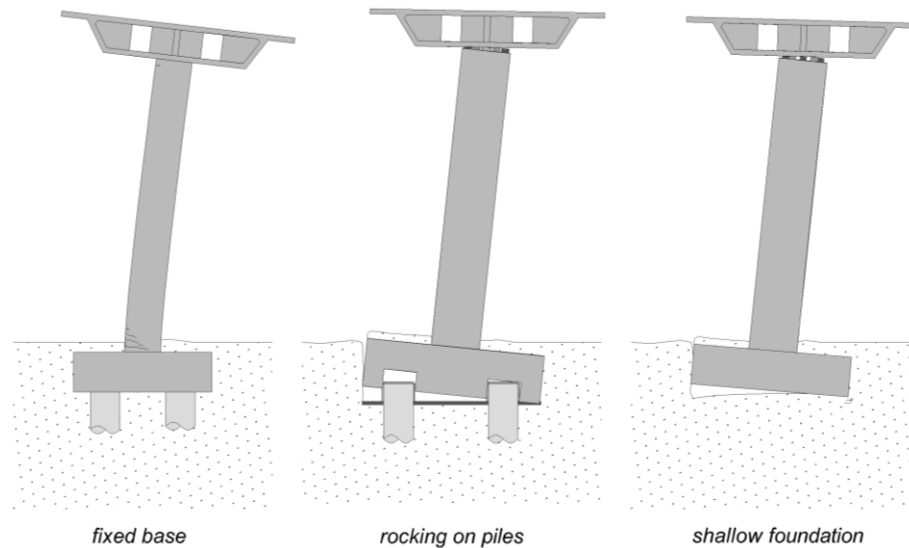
Schematic of foundation, column and deck in a deformed state at a 5% transverse drift ratio for the three designs studied (displacements are drawn magnified by 2).
